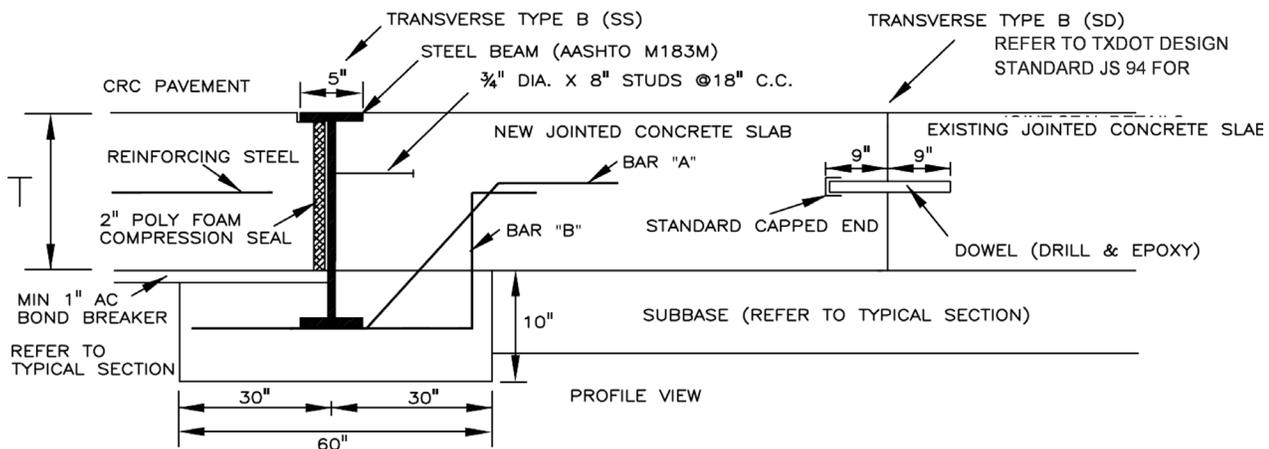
Transition details between CRC and JC pavements using a sleeper slab and a wide-flange I-beam.
